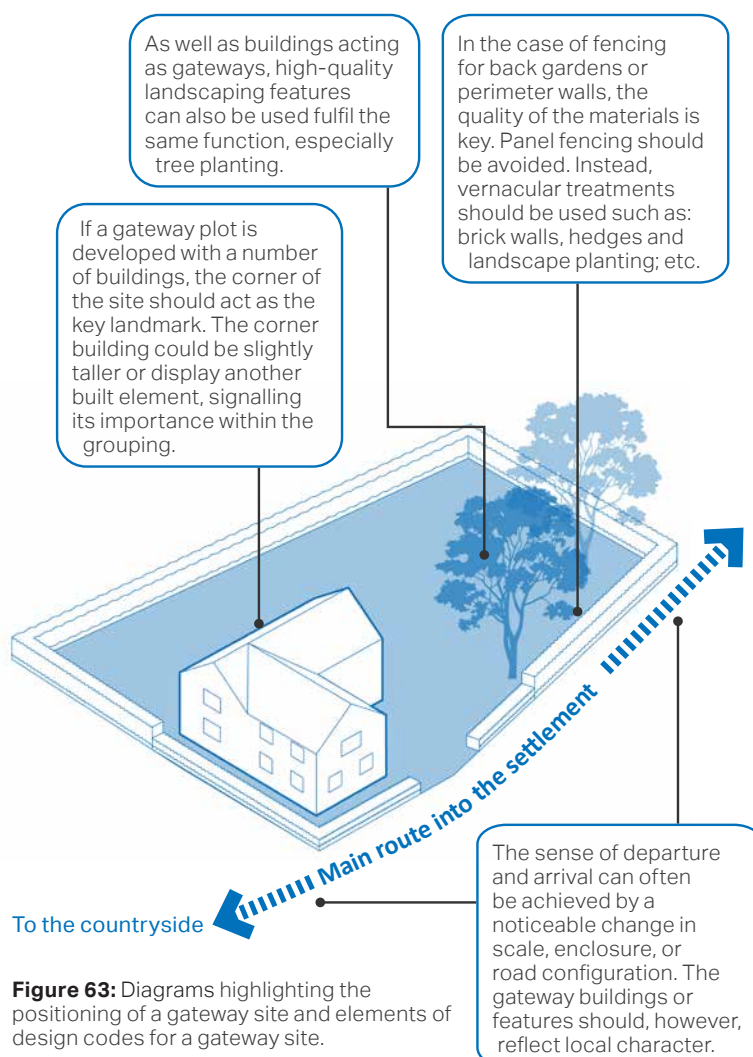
Diagrams highlighting the positioning of a gateway site and elements of design codes for a gateway site.
